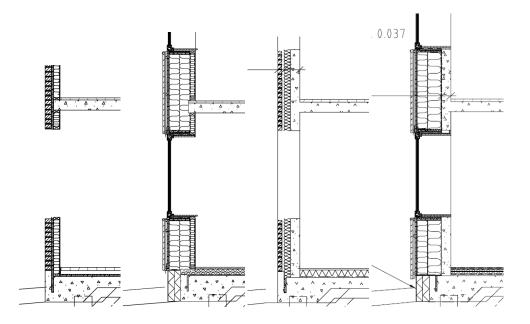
Brogården house J. Wall renovation in the pilot project. From left to right: Original infill wall, infill wall after renovation, original load bearing wall, load bearing wall after renovation. (source: WSP)
